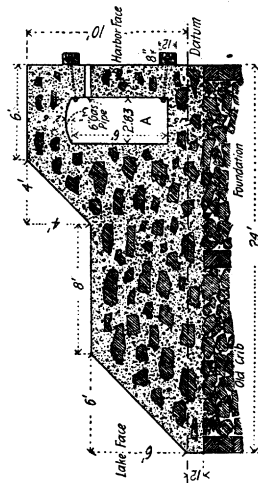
Cross Section of Breakwater, Marquette, Michigan, Showing Passageway to the Lighthouse at the End.
